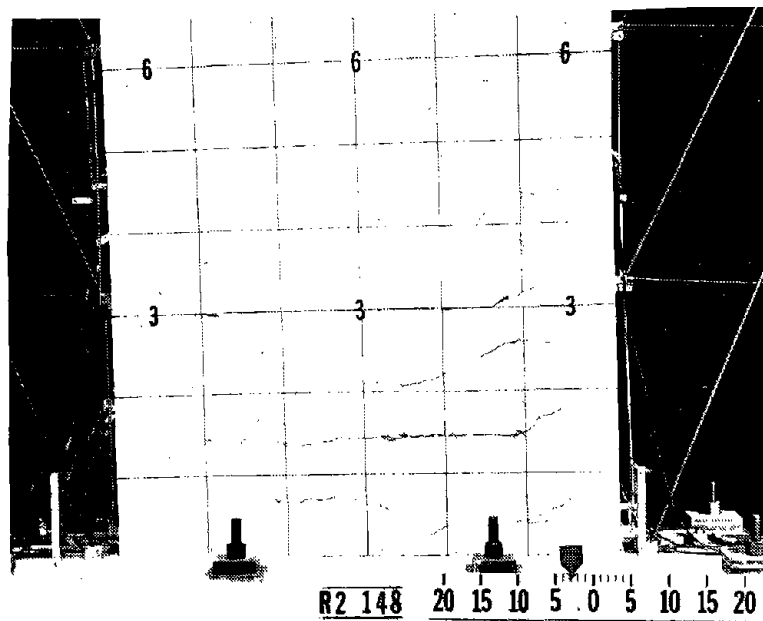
Cracking Pattern at -3 in. Deflection for Specimen R2
